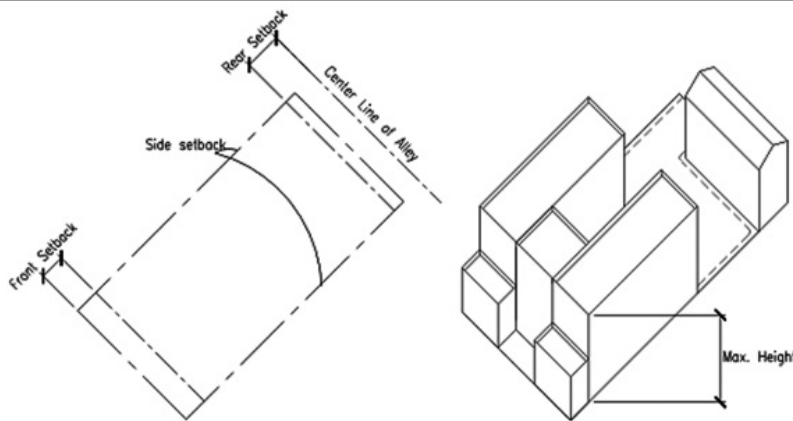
C : ILLUSTRATION OF TOWNHOUSE BUILDING FACADE
